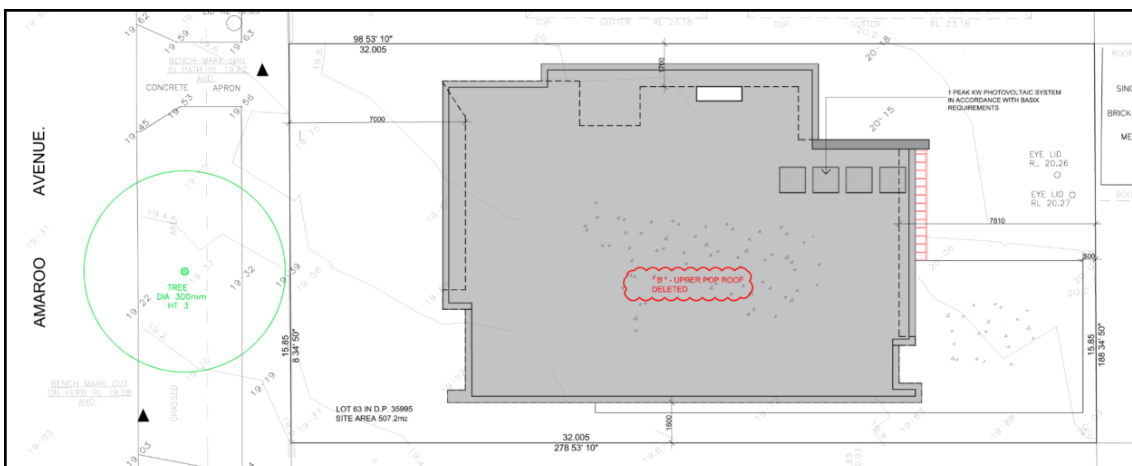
Roof plan 1364 - 02 Rev. B (IDAP assessed 29 April 2022)
